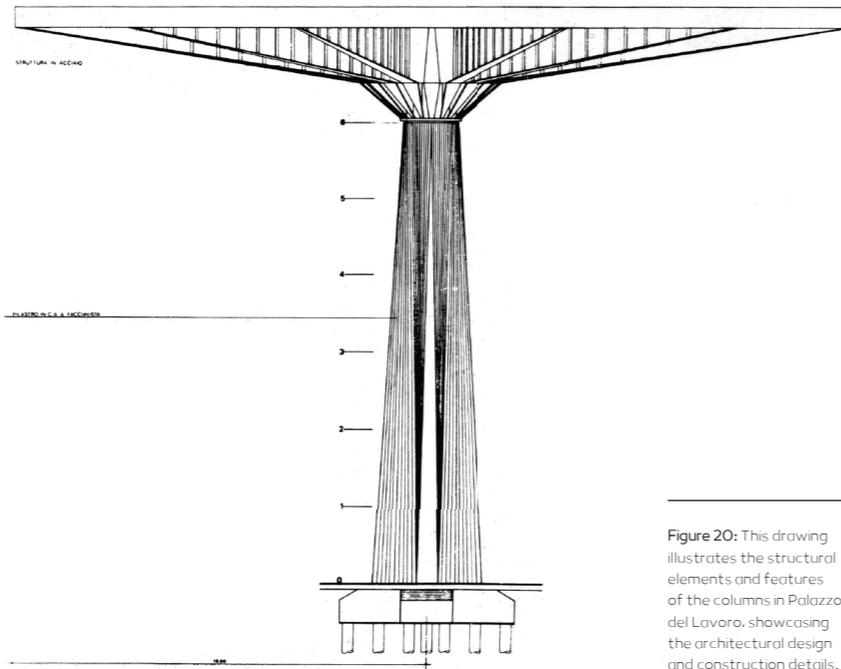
This drawing illustrates the structural elements and features of the columns in Palazzo del Lavoro, showcasing the architectural design and construction details. (atlasofplaces).
